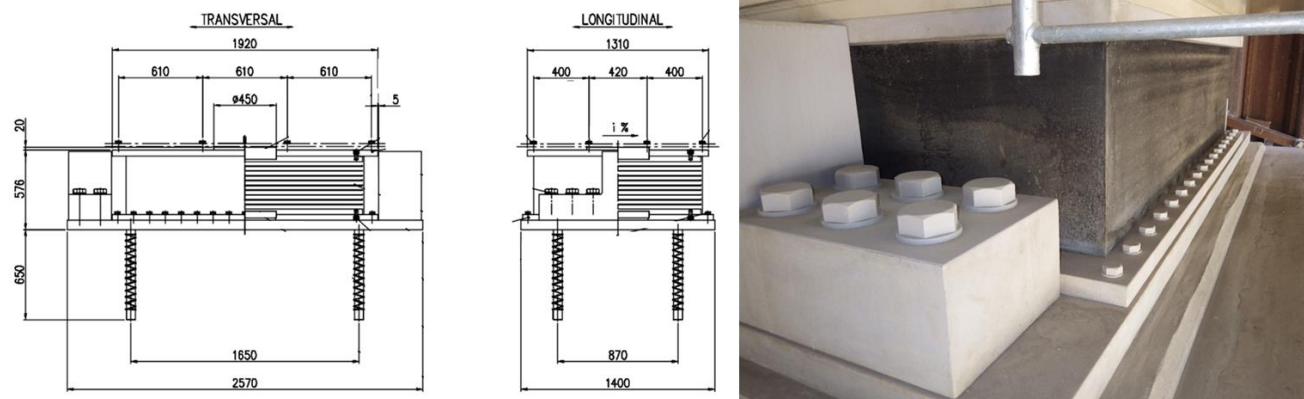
HDR-S used for the new construction of the 2nd Meghna Bridge
